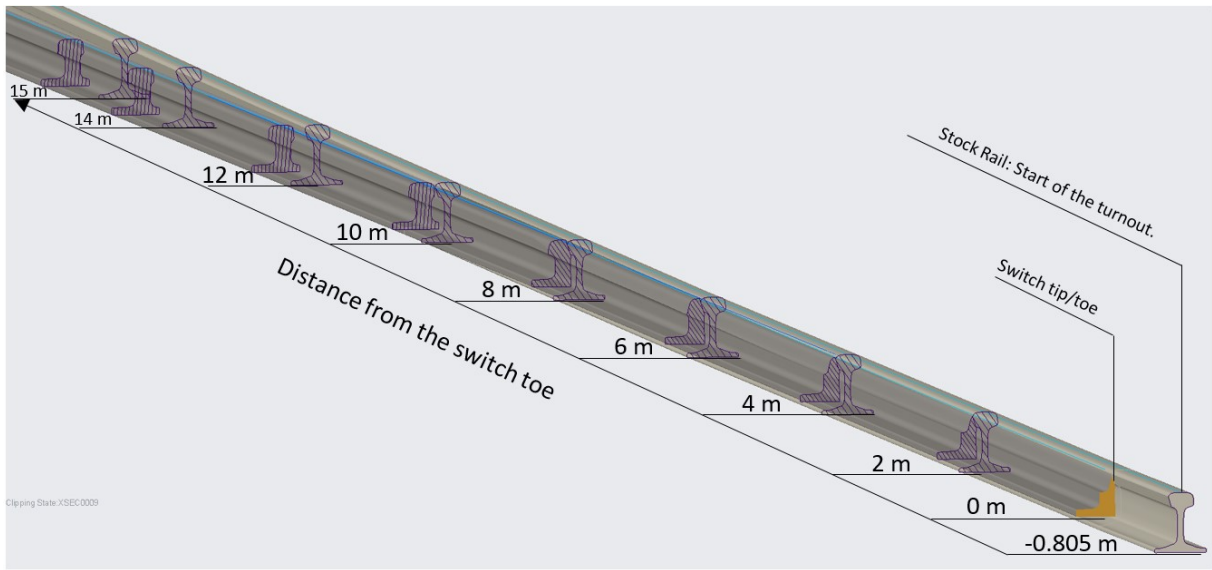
3D schematic of the rails of the 60E1-760-1:15 switch layout with the key longitudinal positions.
